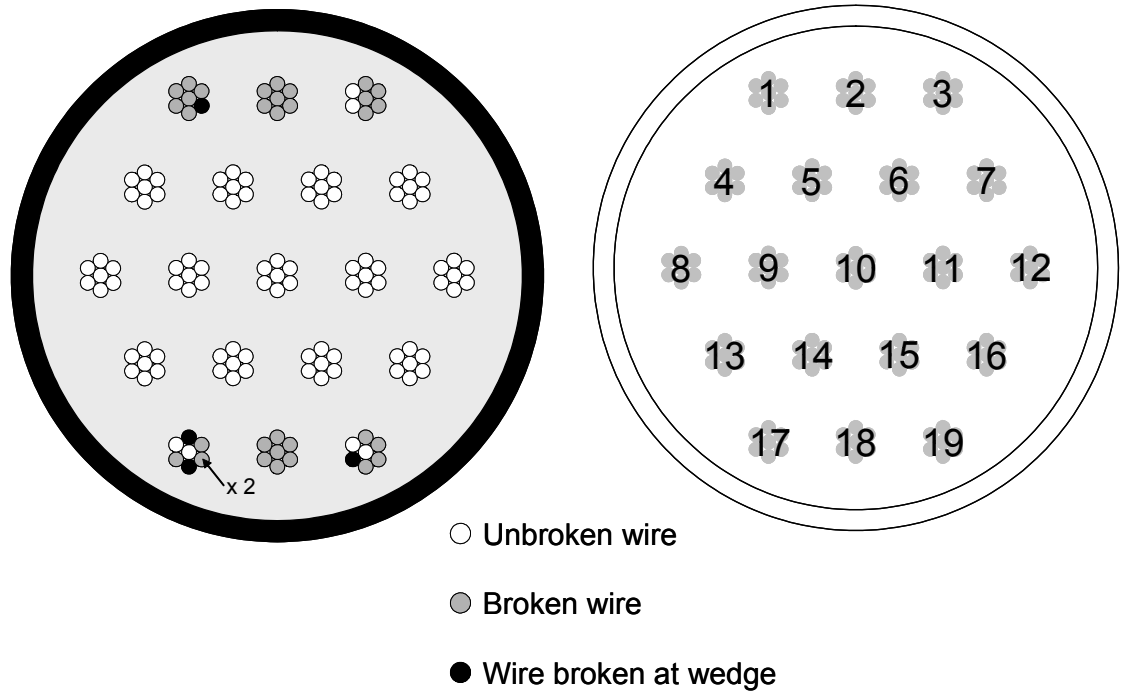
Wire breaks at tower anchorage - Specimen 7
